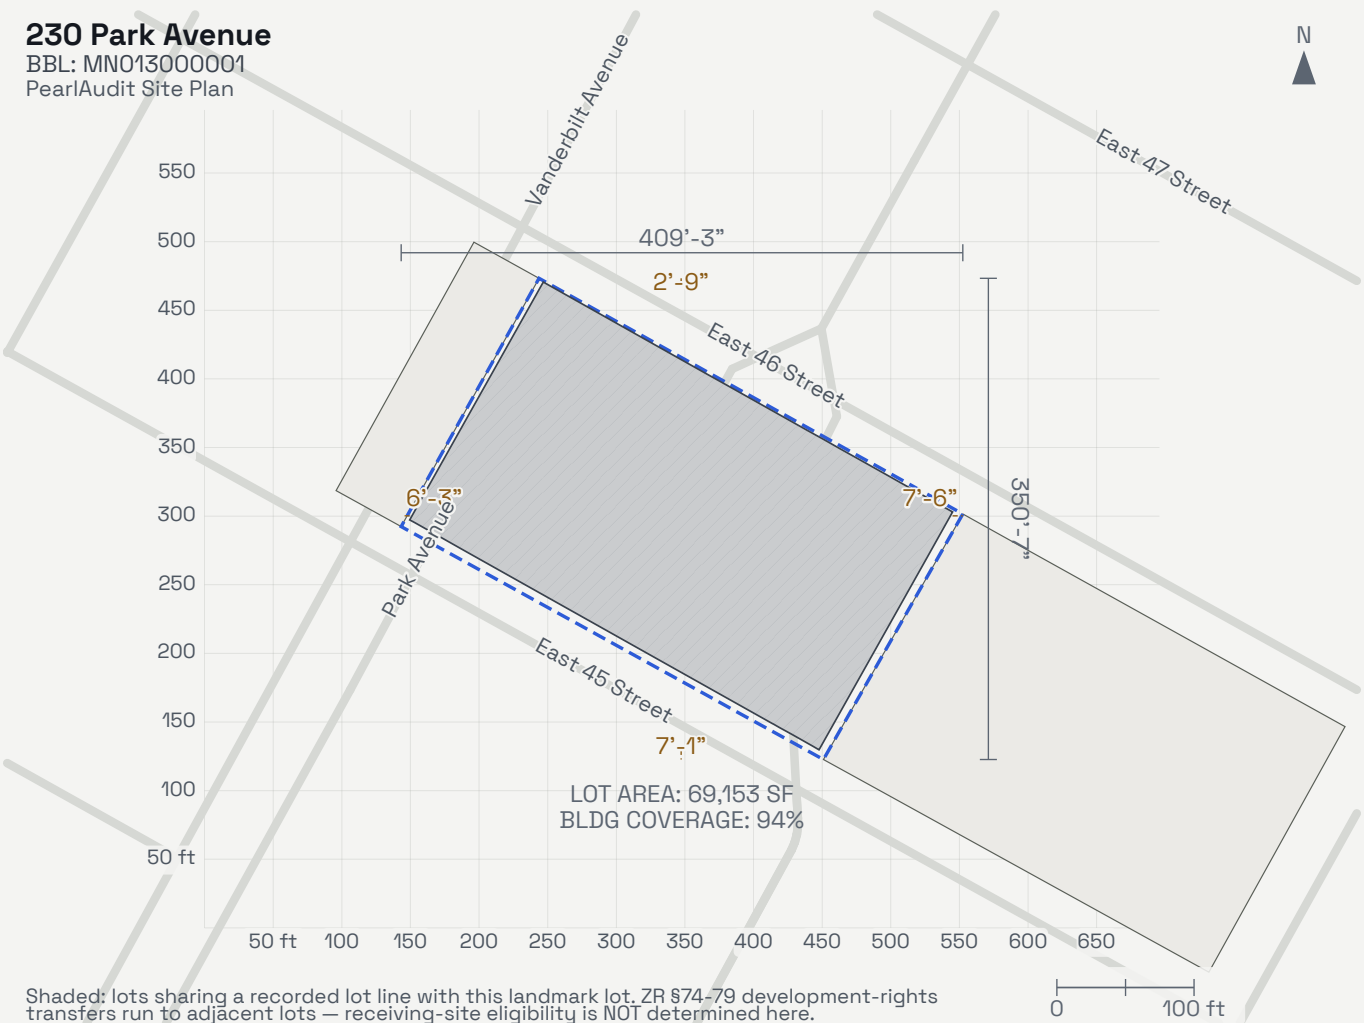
Architectural site plan synthesized from NYC municipal tax-lot and aerial records. (Note: Aerial photogrammetry may cause tall structures to exhibit roofline parallax or overhangs beyond the lot boundary). Not a legal survey.
